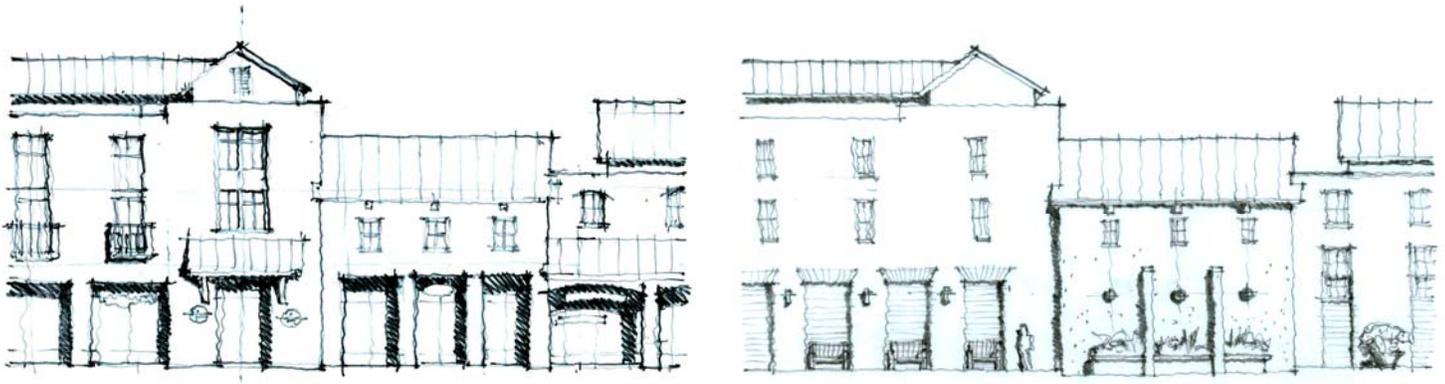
To the maximum extent feasible, building entrances, retail storefronts, and other active spaces shall be oriented towards adjacent streets, public plazas, and pedestrian walkways (left). Where a direct connection cannot be made between interior and exterior spaces for programmatic reasons, building walls shall be articulated at ground level using a variety of architectural features to provide pedestrian interest (right).
